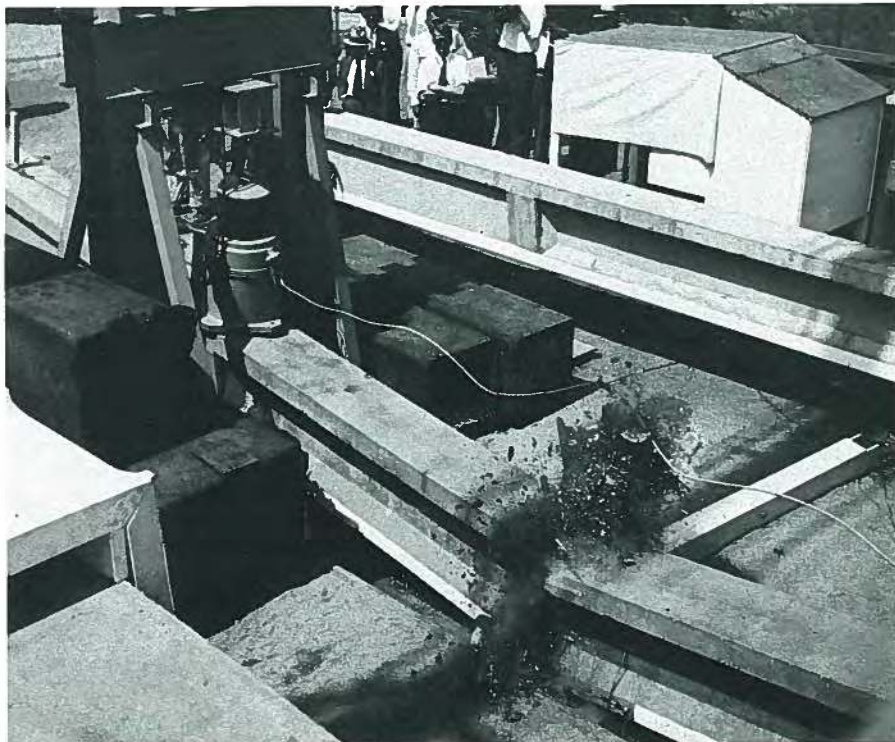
Explosive failure (with top flange failing in compression) of 40-ft (12.2 m) girder (P-40) using unbonded tendons (Austin Company tests).
